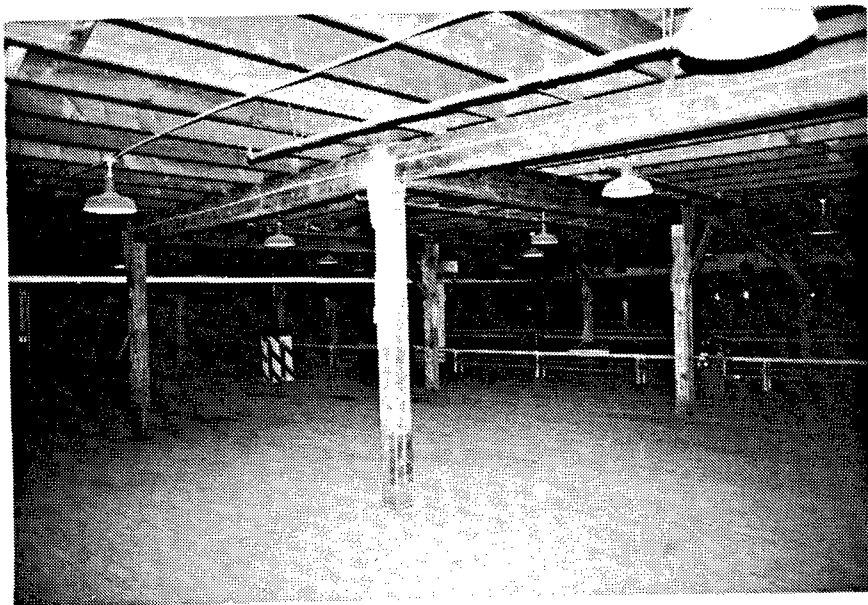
Building 503: Interior view of the second floor of this Small Caliber Loading Plant.
